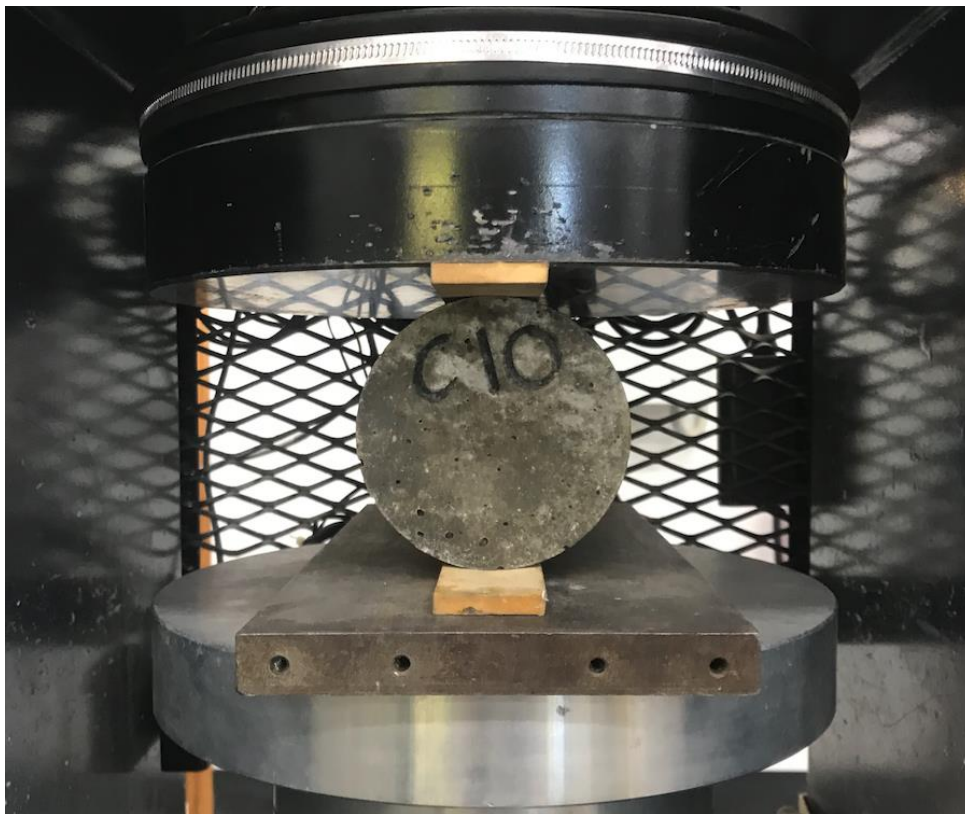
Splitting tensile test specimen ready for testing in compression machine.
